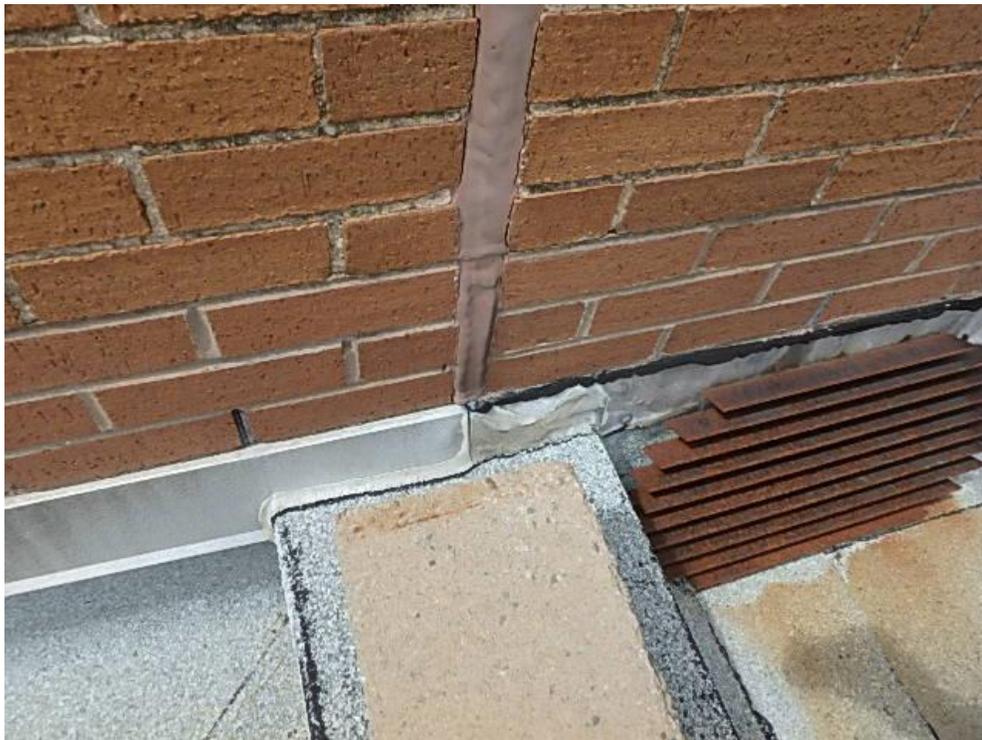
Roof Area 1.1. Metal stairs and landing with rust staining of unprotected membrane below.
